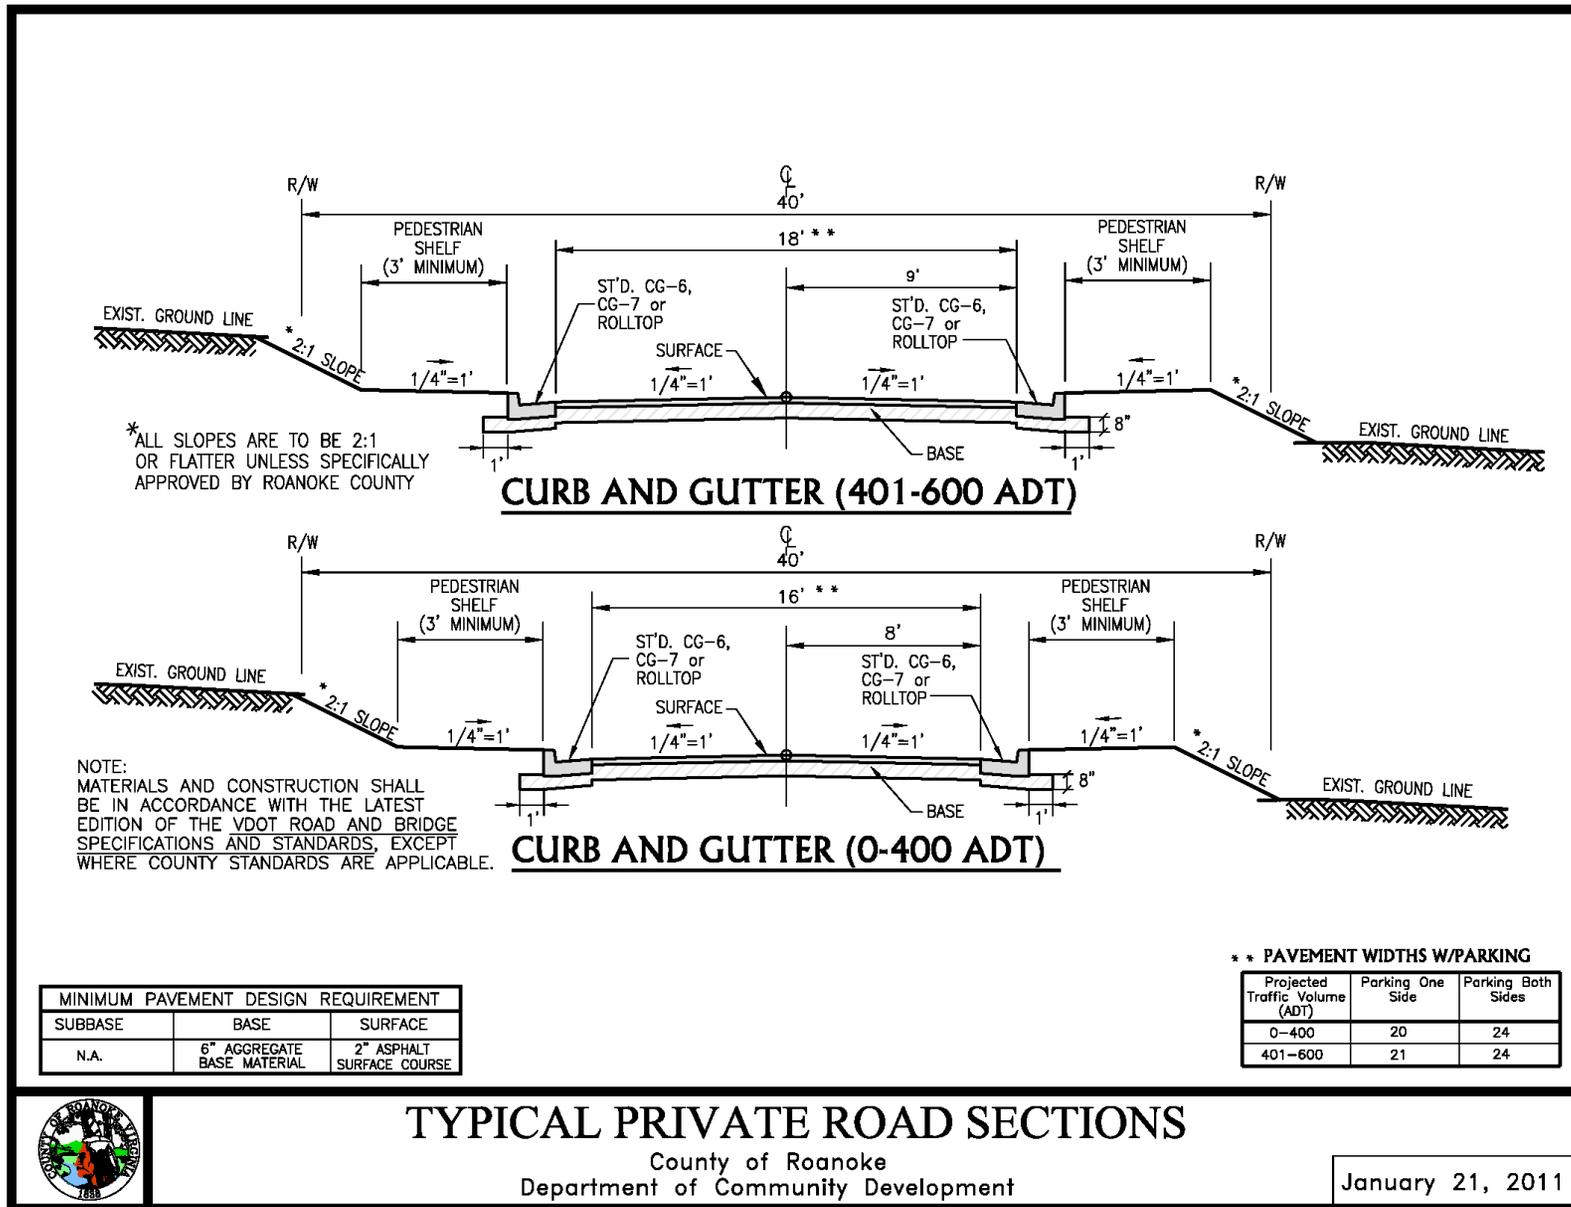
Curb and Gutter Typical Private Road Sections
